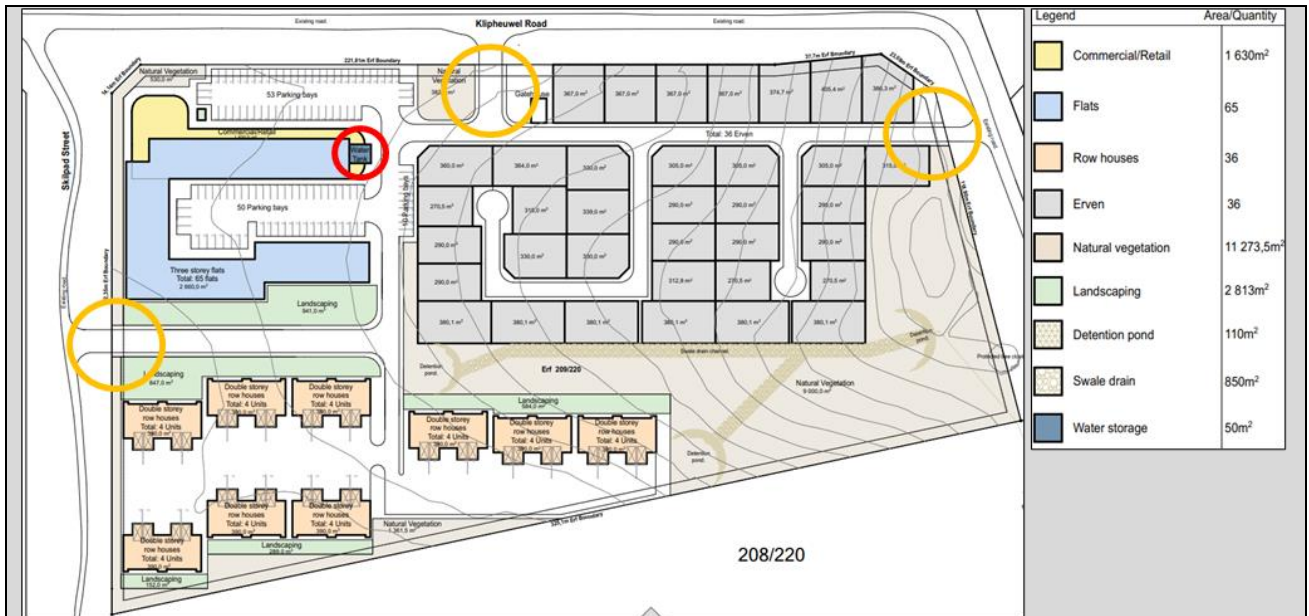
Mitigated Site Development Plan (source: Hamilton Wessels Architects).
